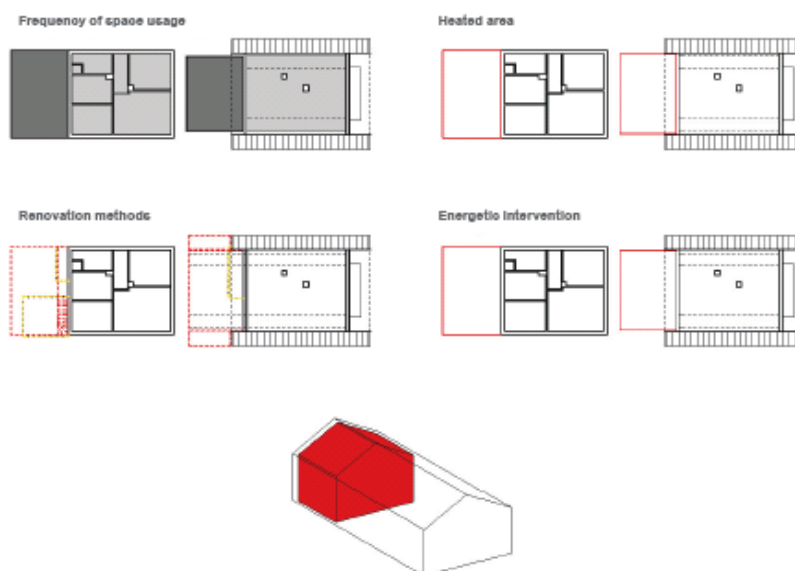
Alternative concepts for AlpHouse pilot-building S. in Schleching-Ettenhausen, by TUM Landraum
